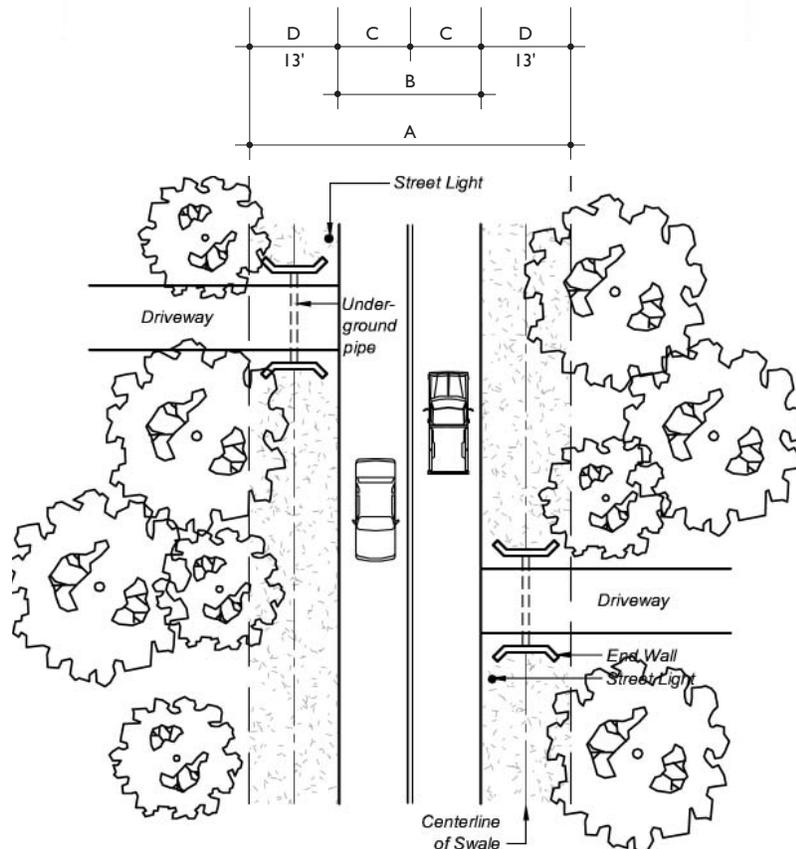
Typical 50-Foot Preserve Drive (PD-50) Section
